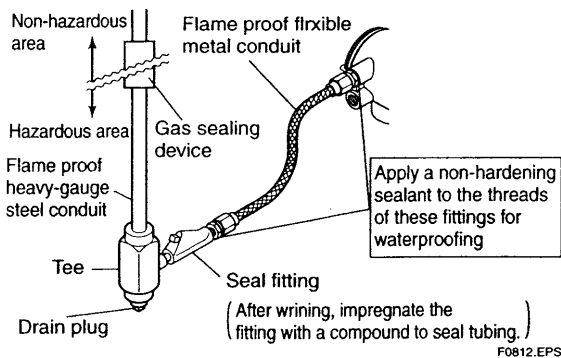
Typical Wiring Using Flame proof Metal Conduit
